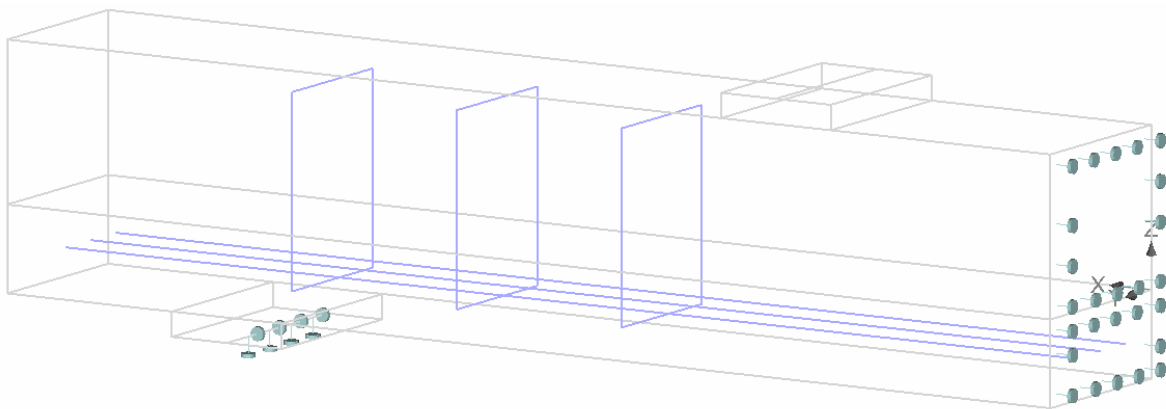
Example of ATENA model showing the half of the beam that was modelled, steel plates for loading/support (100x150x20 mm), longitudinal reinforcement (3  $\phi$  8 mm) and shear reinforcement (3  $\phi$  8 mm, with spacing of 150 mm). Support and conditions for symmetry.
